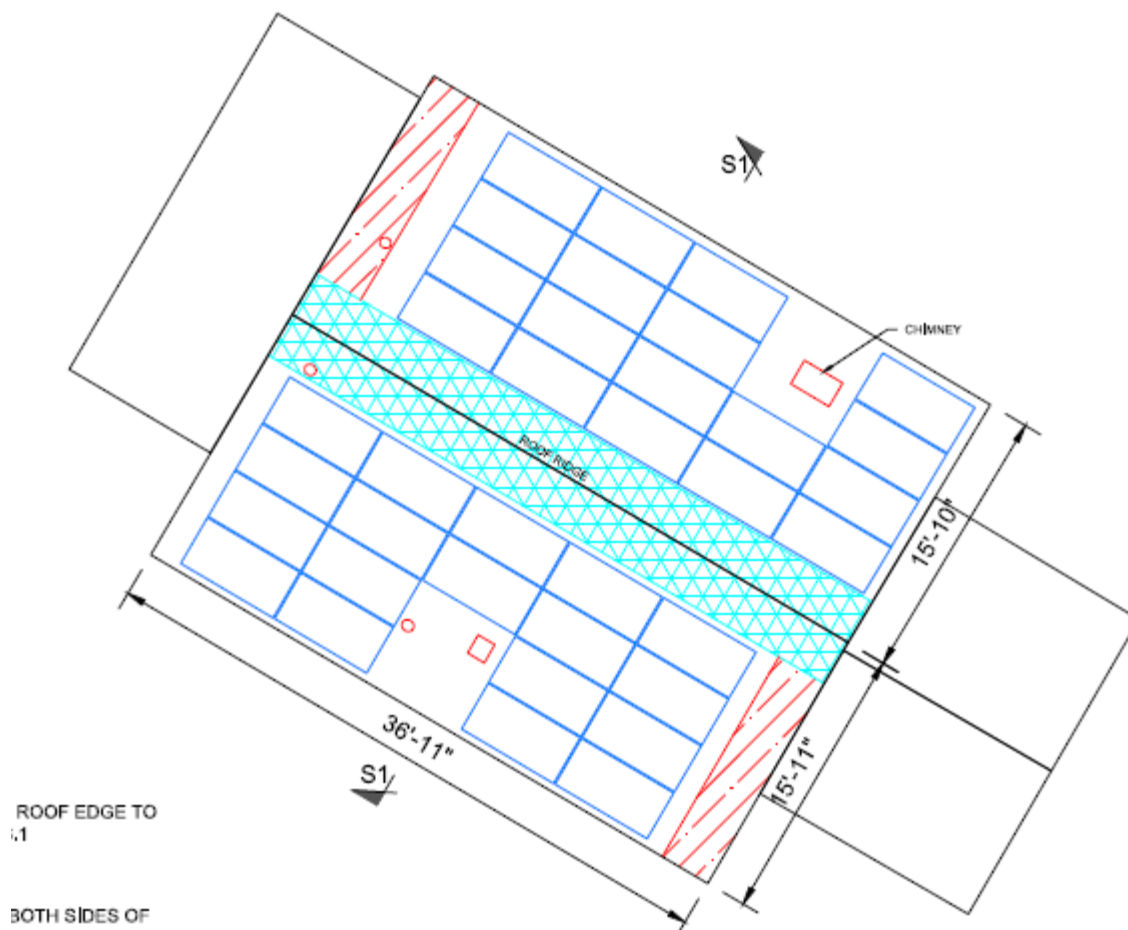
Proposed solar panel layout with the north-facing roof slope showing at the top.
